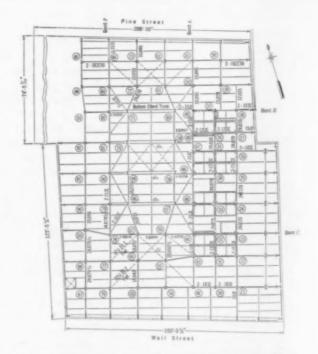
PORTION OF THE THIRD FLOOR FRAMING PLAN
